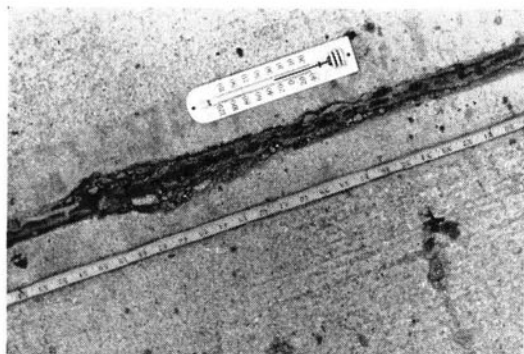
SLIGHT SPALLING ALONG
